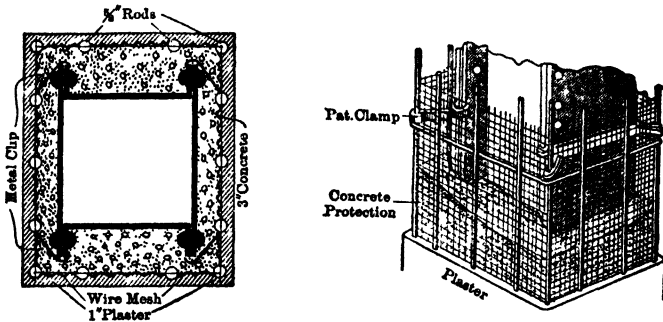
Fireproofing of Steel Columns with Concrete and Plaster.
